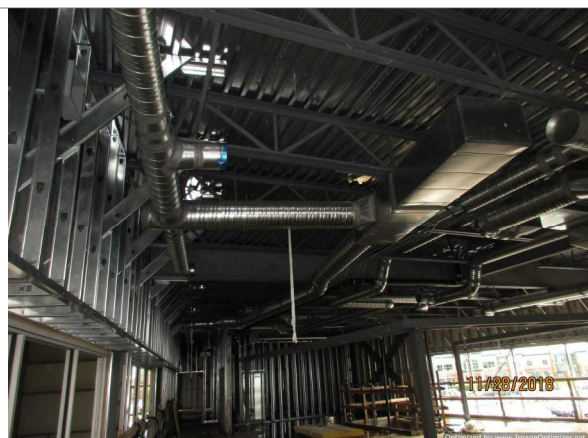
Phase 1A, second floor concession area – sheet metal ductwork install
